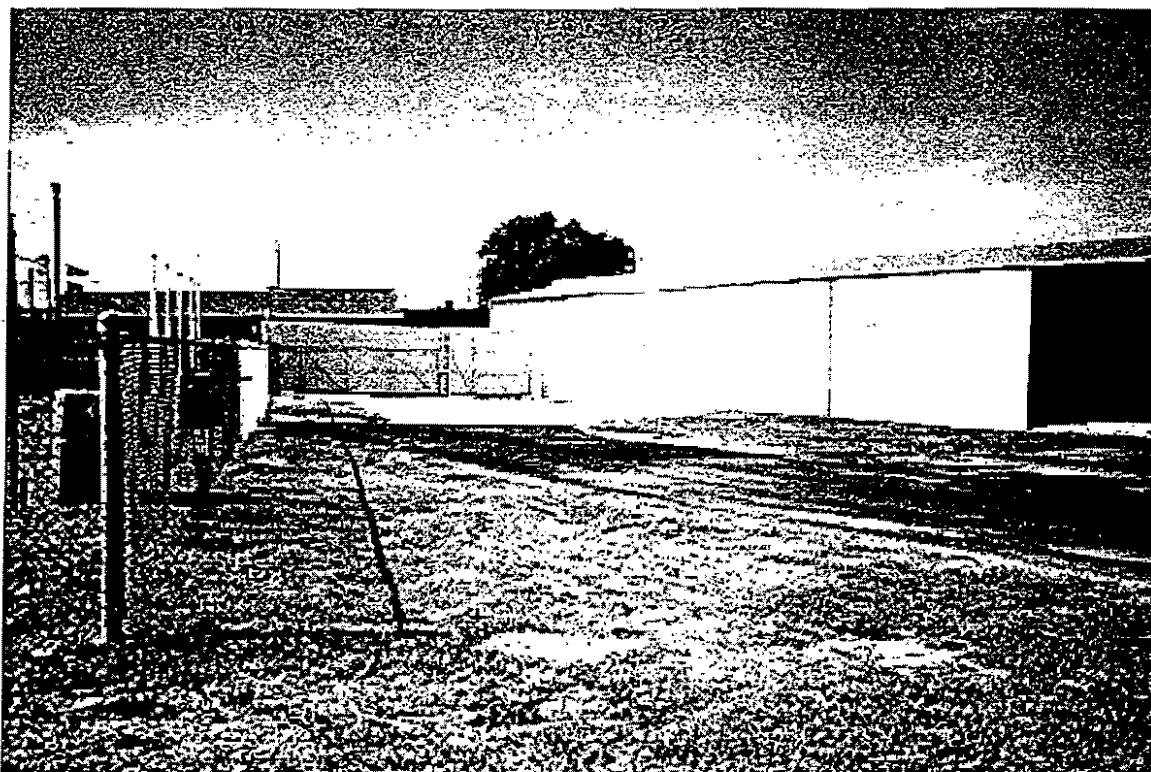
View of low area located west of Facilities #4, #5, and #6. This area drains to the entrance of a concrete culvert on the west side of the fence shown in the background of the photo. The culvert drains to a drainage ditch located west of Facility #7. View is to the south.
